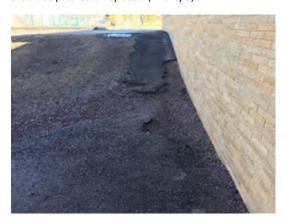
Asphalt in north play area in poor condition. This area should be patched or replaced. (Priority 3)
